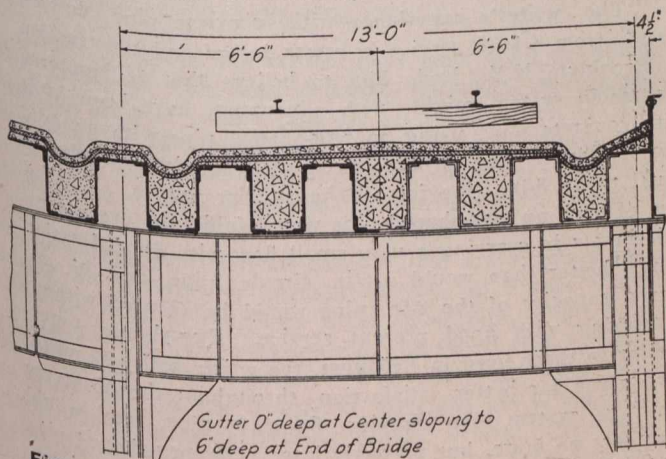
Section of Subway Over Kinzie Street, Chicago.
